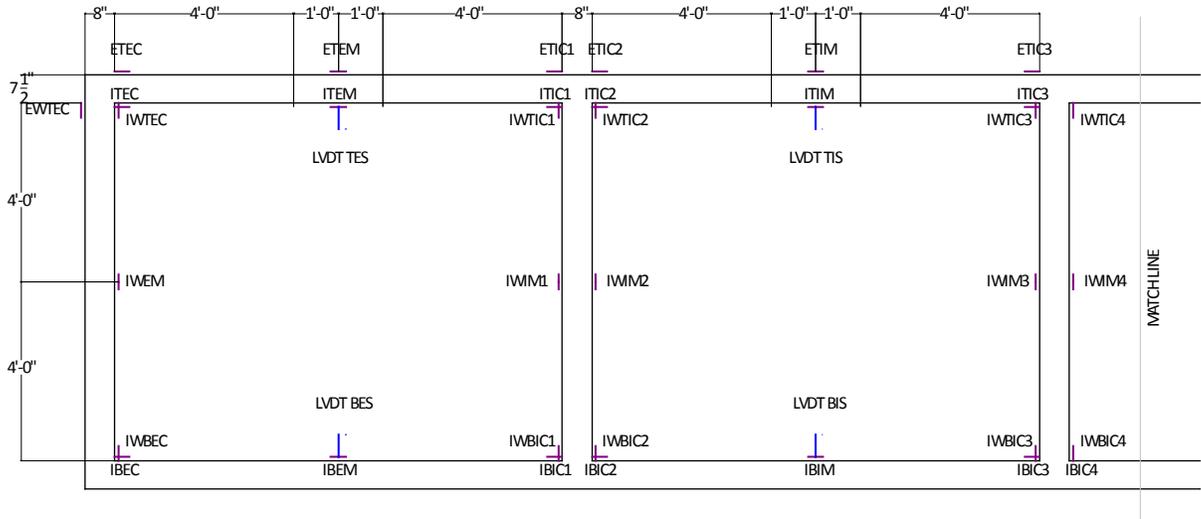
SHALLOWATER INSTRUMENTATION PLAN.
